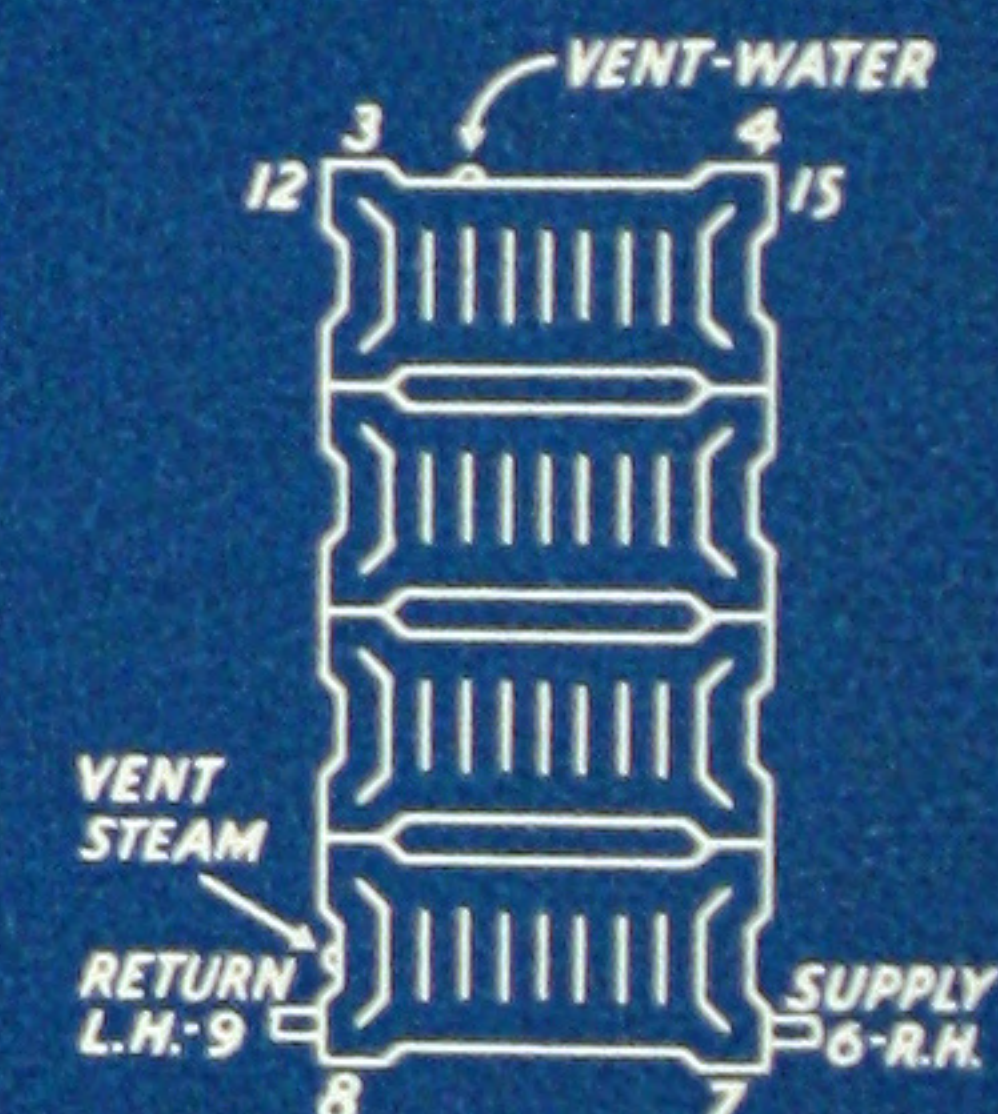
Assembled in single stack. Water or one and two pipe steam.
